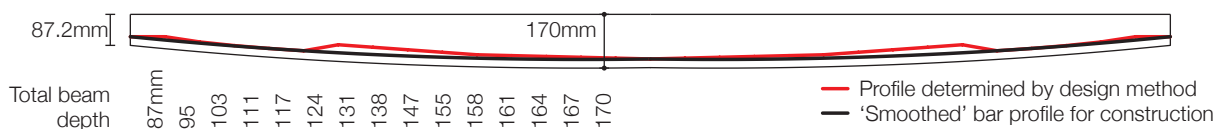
Longitudinal steel profile, Beam 8\_1.
